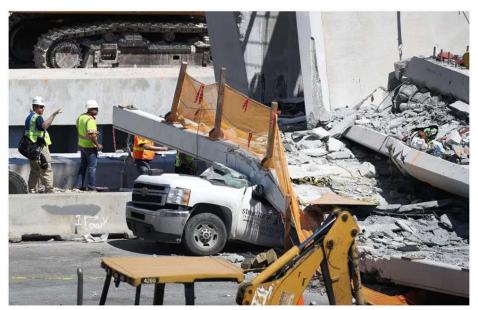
Ongoing Investigation after Bridge Collapse [4]
